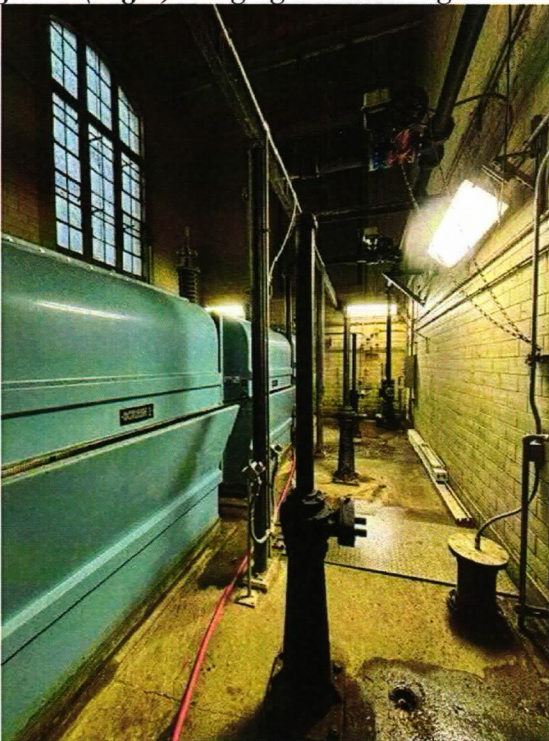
(Left): Screen Room on Pump Side looking North towards garage opening
